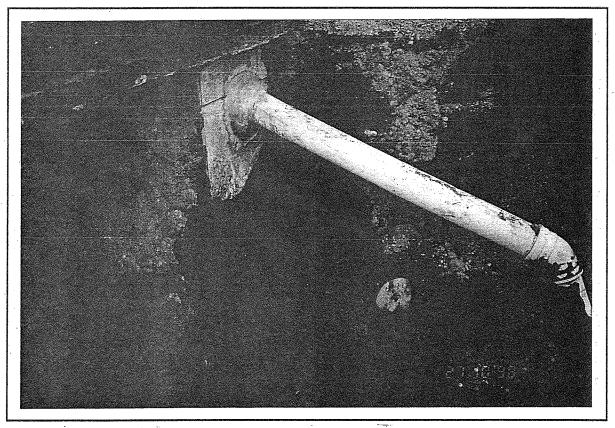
Patch Repair on Discharge Pipe Below O/W Separator.
